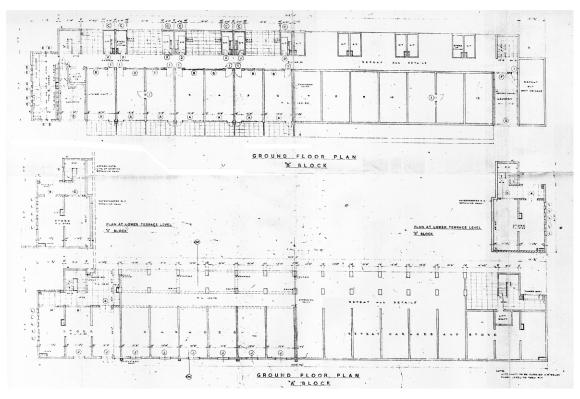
Ground floor plans of Block A and B. (Courtesy of Architectural Services Department, Hong Kong SAR Government, Asiatic Police Quarters – Ground Floor Plan, 1950, drawing no.: A36/2, Microfilm ID: 36803.)
